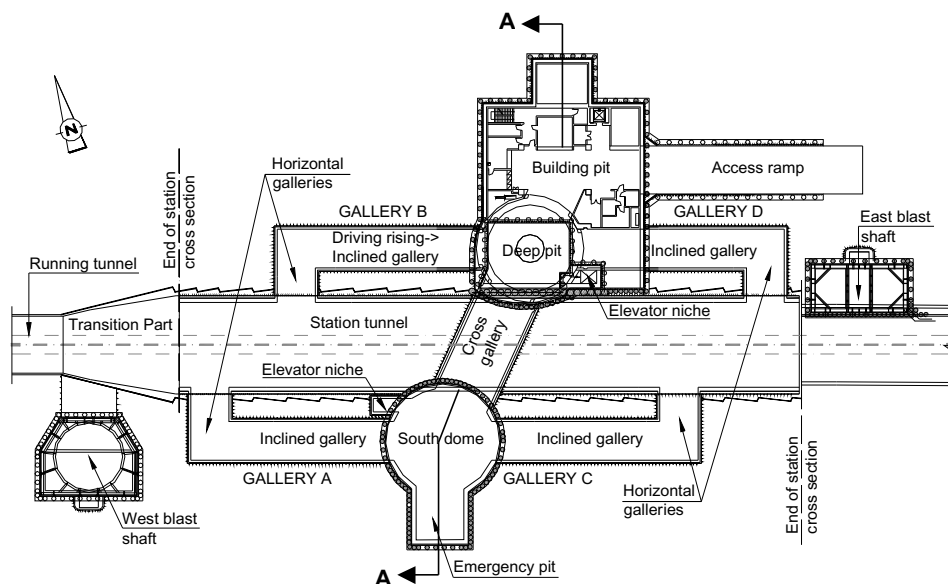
Plan view of Eleonas underground complex at the final construction stage.
